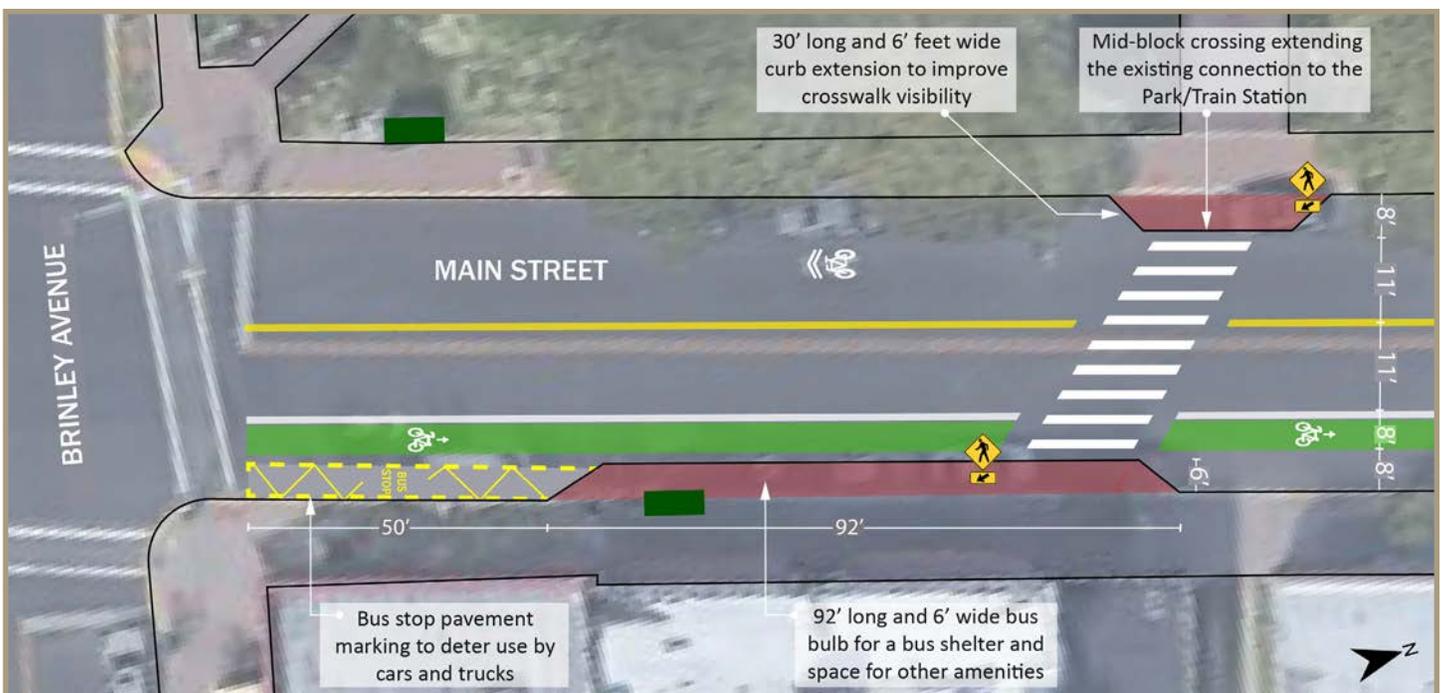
Proposed bus bulb and mid-block crossing on Main Street, between Brinley and LaReine Avenue.
